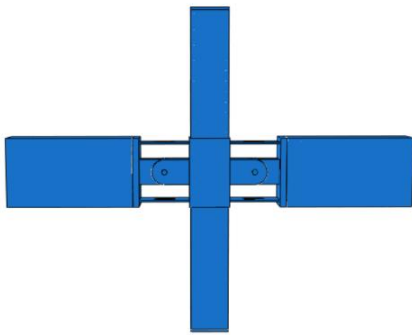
Prefabricated beam column components with energy consuming steel plates.
